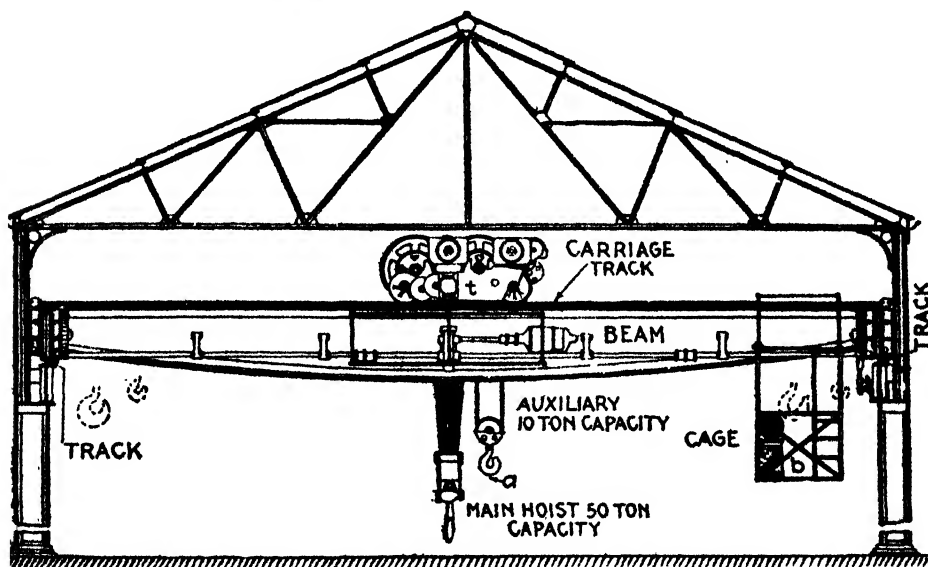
,821.—Cross section of electrical station showing a traveling crane for the installation or removal of large and heavy machine parts. The track upon which the crane moves is not supported by the walls of the building, but rests upon beams specially provided for the purpose. In addition to the horizontal motion thus obtained, another horizontal motion at right angles to the former is afforded by means of the carriage which, being also mounted on wheels, runs upon a track on the top of the beam. In the larger sizes of electric traveling crane, a cage is attached to the beam for the operator, who, by means of three controllers mounted in the cage, can move a load on either the main or auxiliary hoist in any direction.
